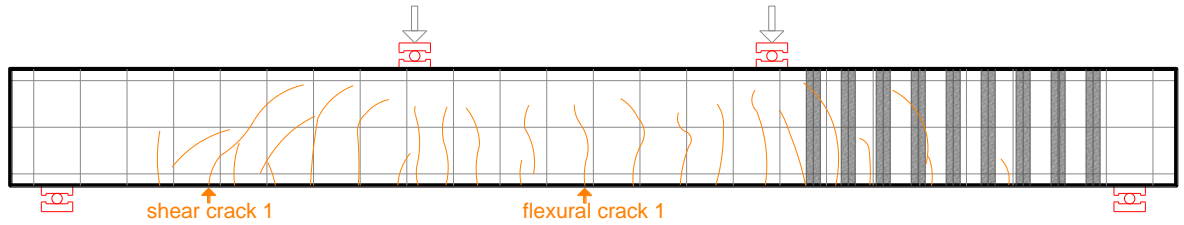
Crack pattern at the end of the testing (CB51-P80)
